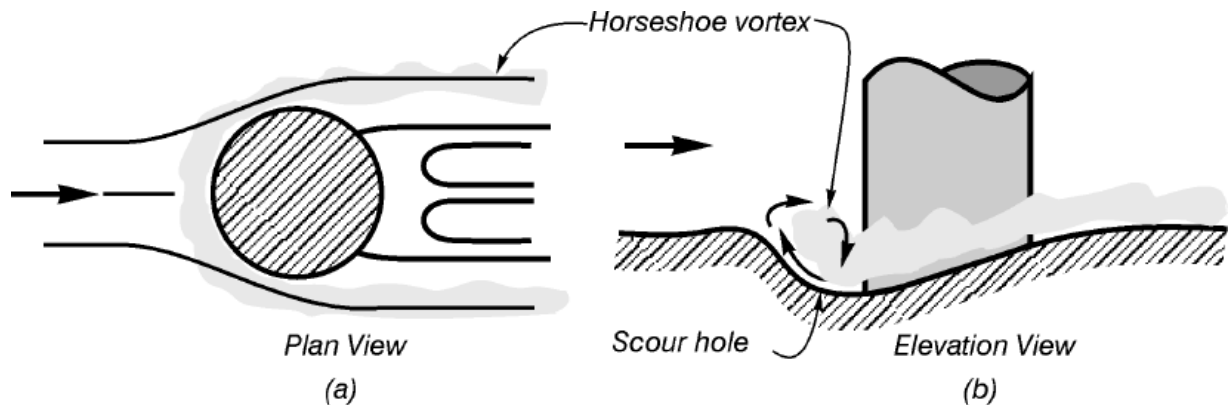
Erosion around a bridge pier caused by a horseshoe vortex.
